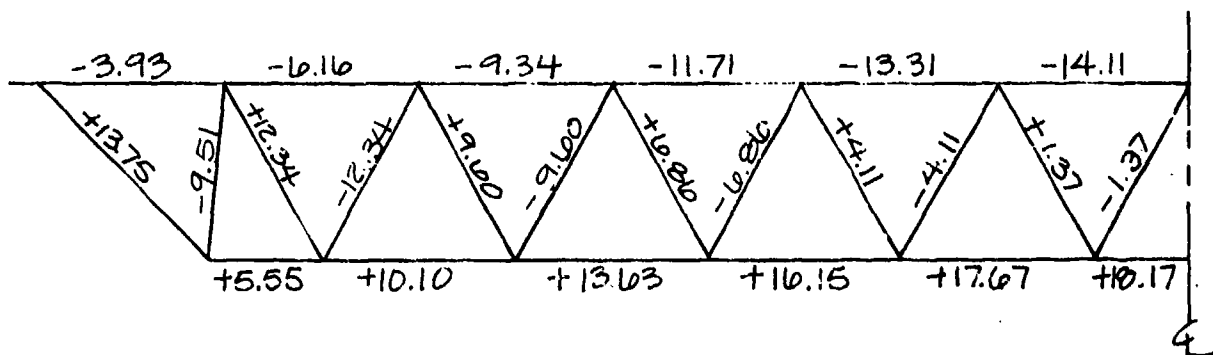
Analysis of Bethlehem Steel Open-Web Joist — 20-ft Span
